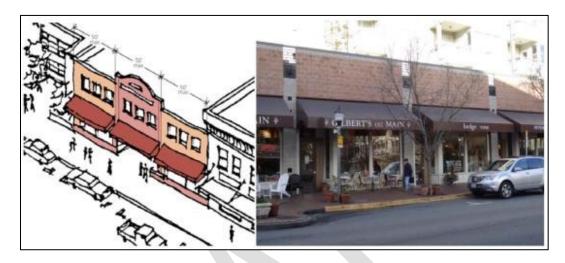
Examples That Do Not Meet Maximum Facade Width Provisions
